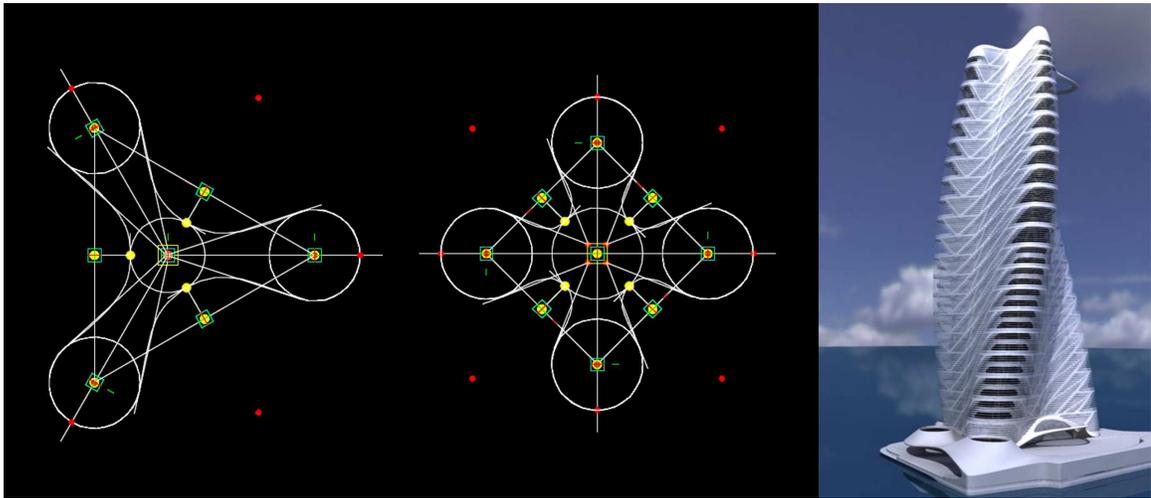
DF and PV in Study 1: Flexible Twisted Tower Plan.
